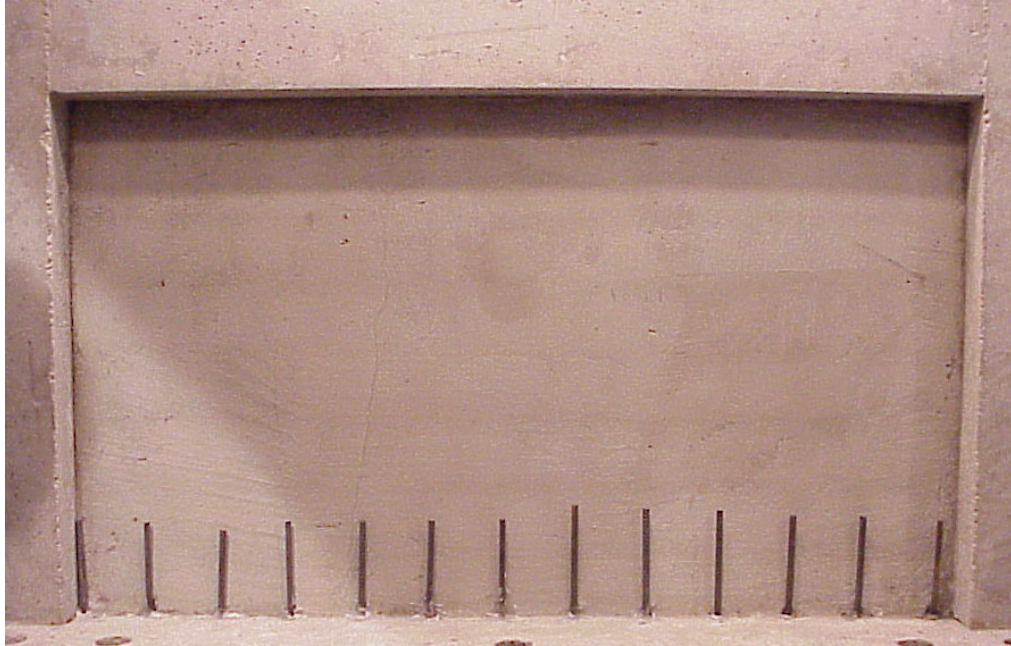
Anchorage bar arrangement for Specimen CID1 and LID1
